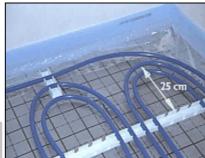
Standard wet floor heating system for construction floors between heated zones (package to be added to the construction floor):
